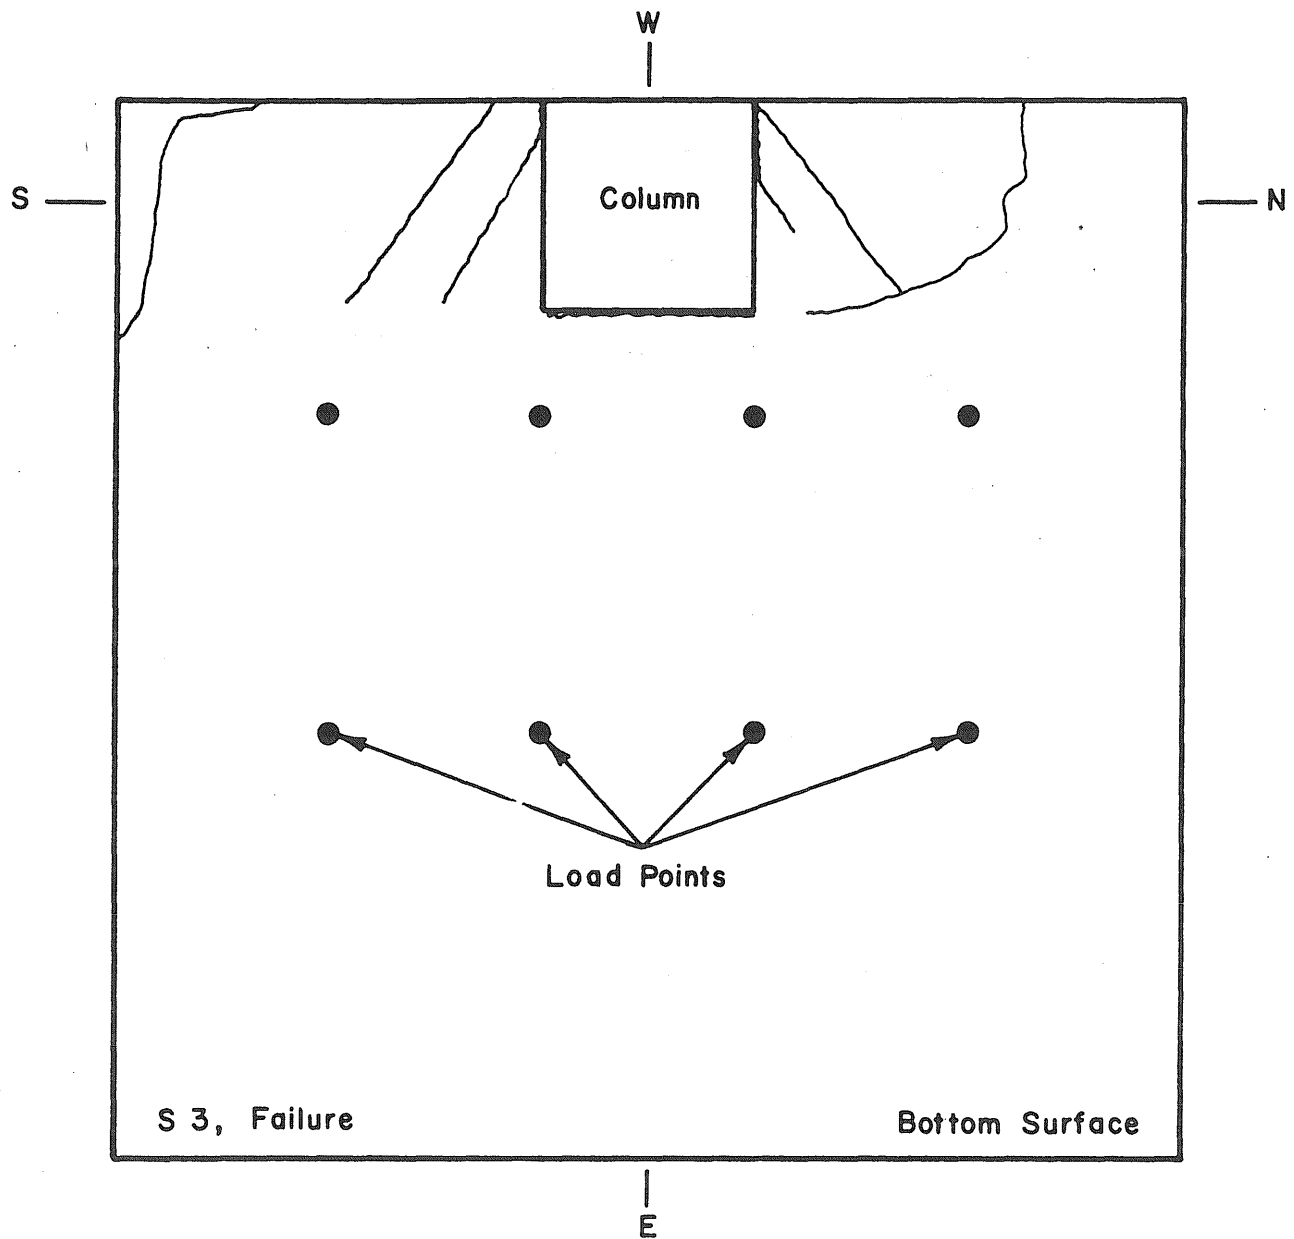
Crack Pattern at Failure on the Bottom Surface of Specimen S3
